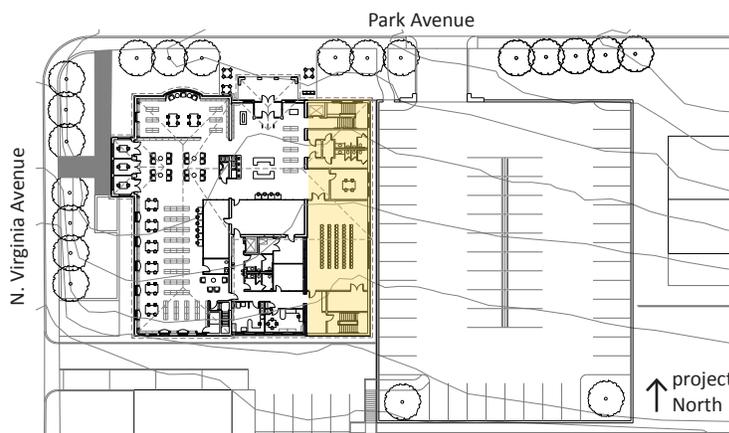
East Expansion Main Level Plan + Parking Deck
